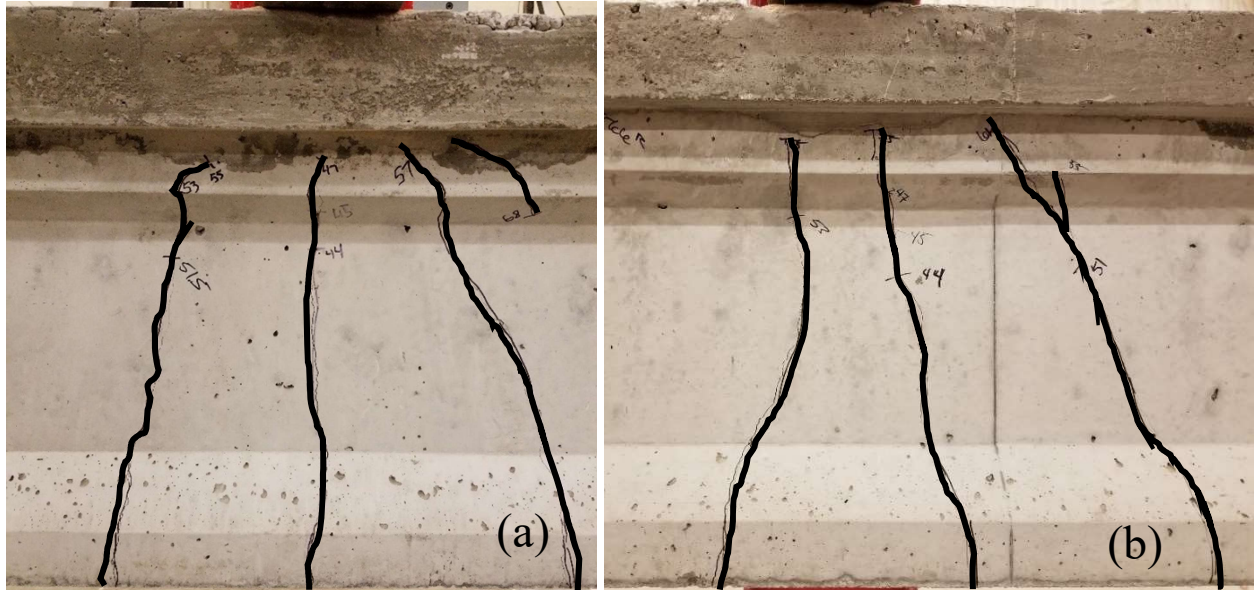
Final flexural cracking under the load point in the RC2-N (a) and RC2-S (b) girders are indicated by dark lines.
